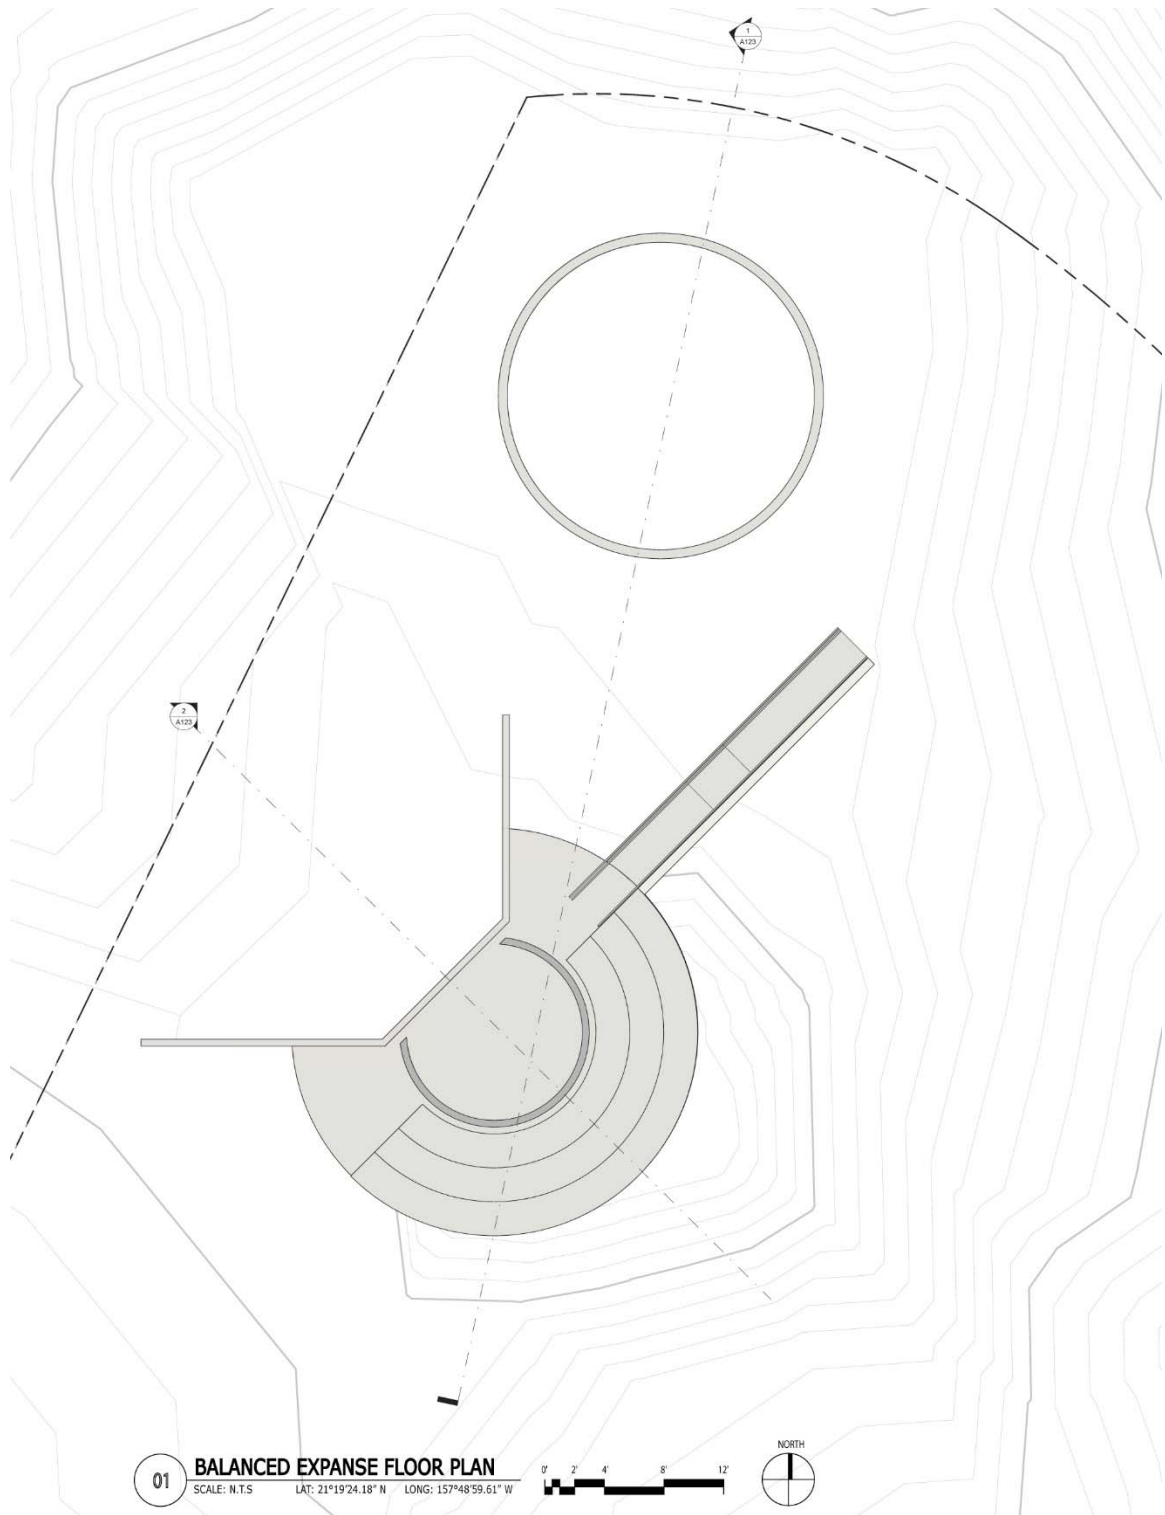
Balanced Expanse Floor Plan. Made by Author.
